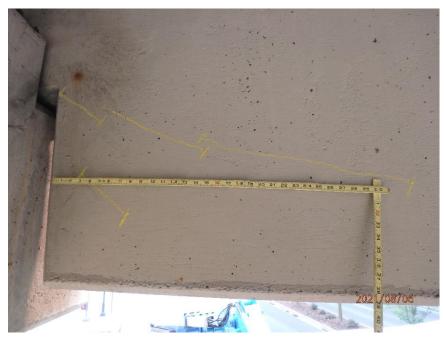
Diagonal Cracks in West Face of Span 2 East Girder at North End, Looking East
